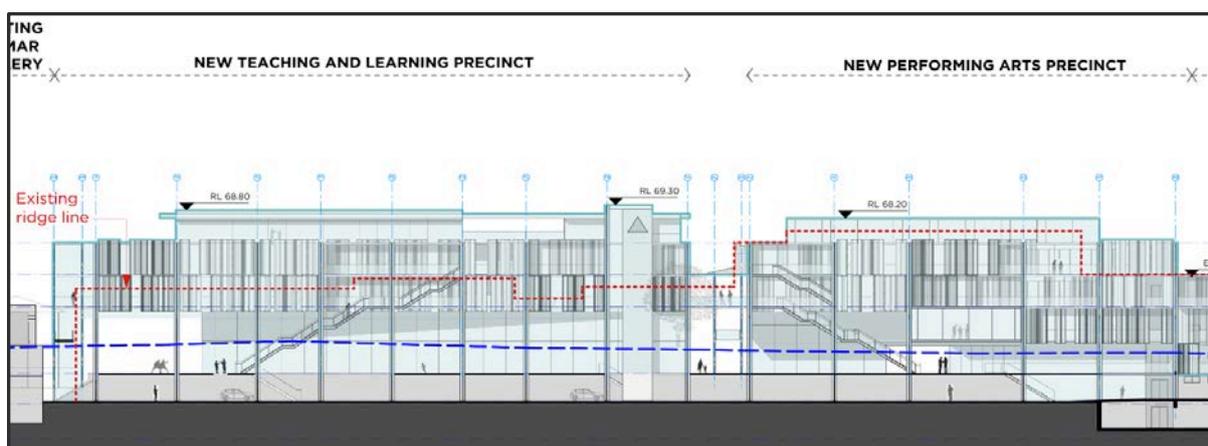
| Western elevation of proposed buildings with ridge line of existing buildings on the site shown in red (Source: Applicant's SRTS 2021)
